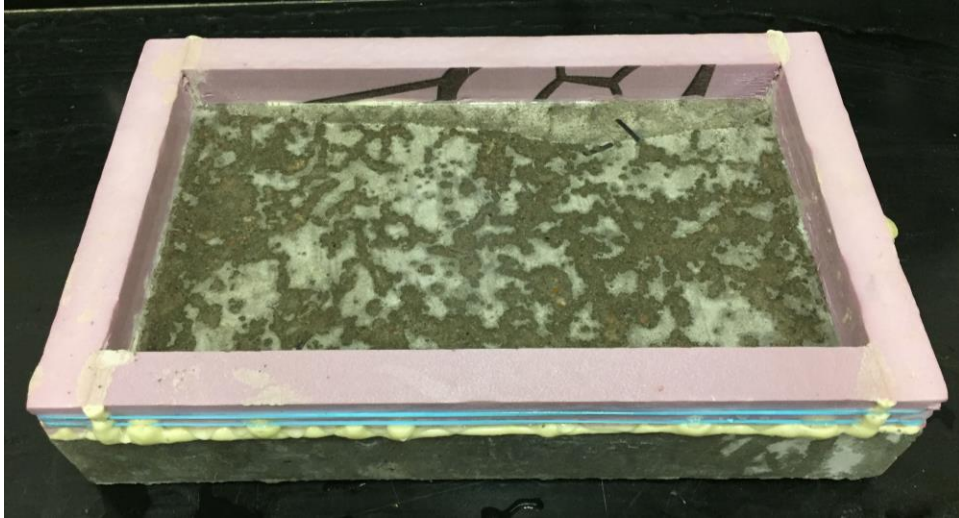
Mix 3-40 Salt Scaling Specimen at 50 Cycles
